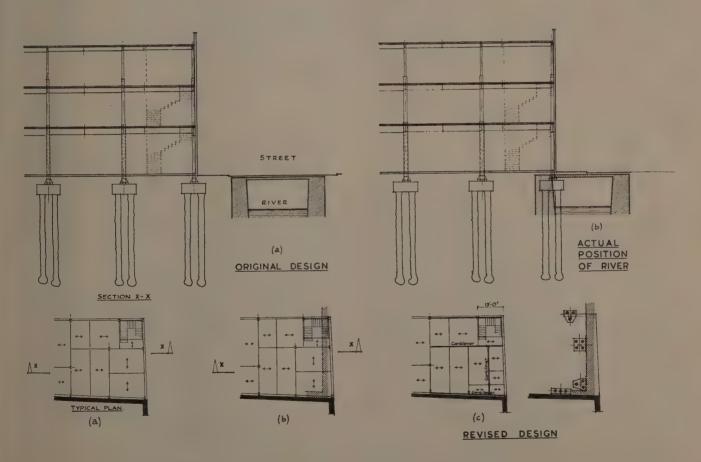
Original Structural Layout, Actual Position of River, and Revised Structural Layout
